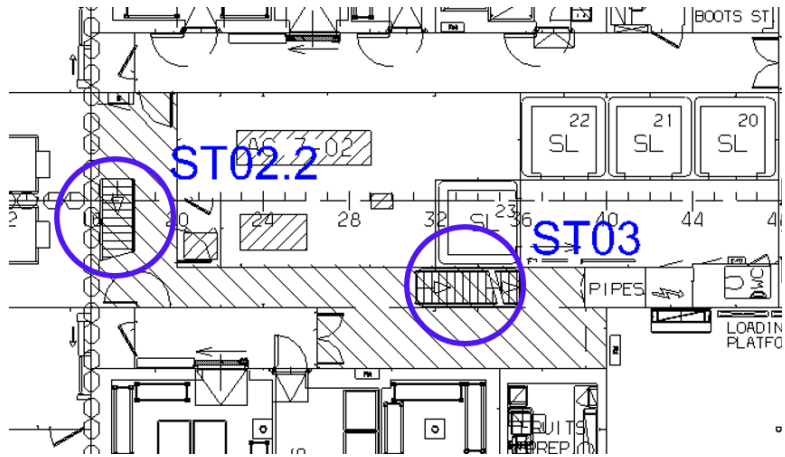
Critical stairwell openings, ST02.2 & ST03, Deck02
